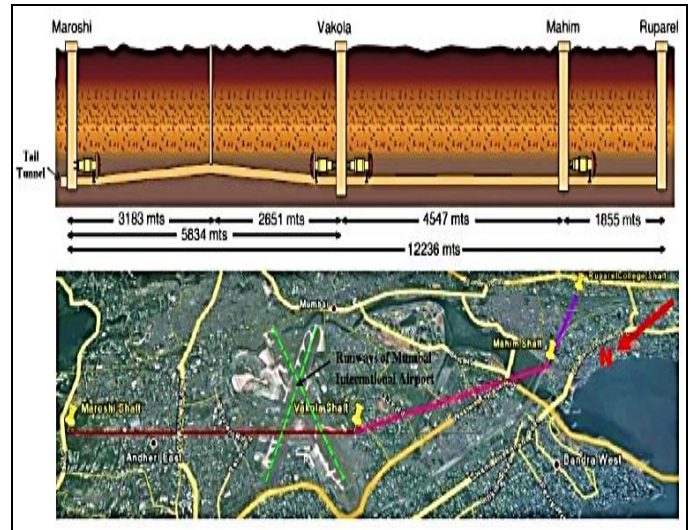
Longitudinal section and plan of tunnel from Maroshi to Ruparel College [7]
